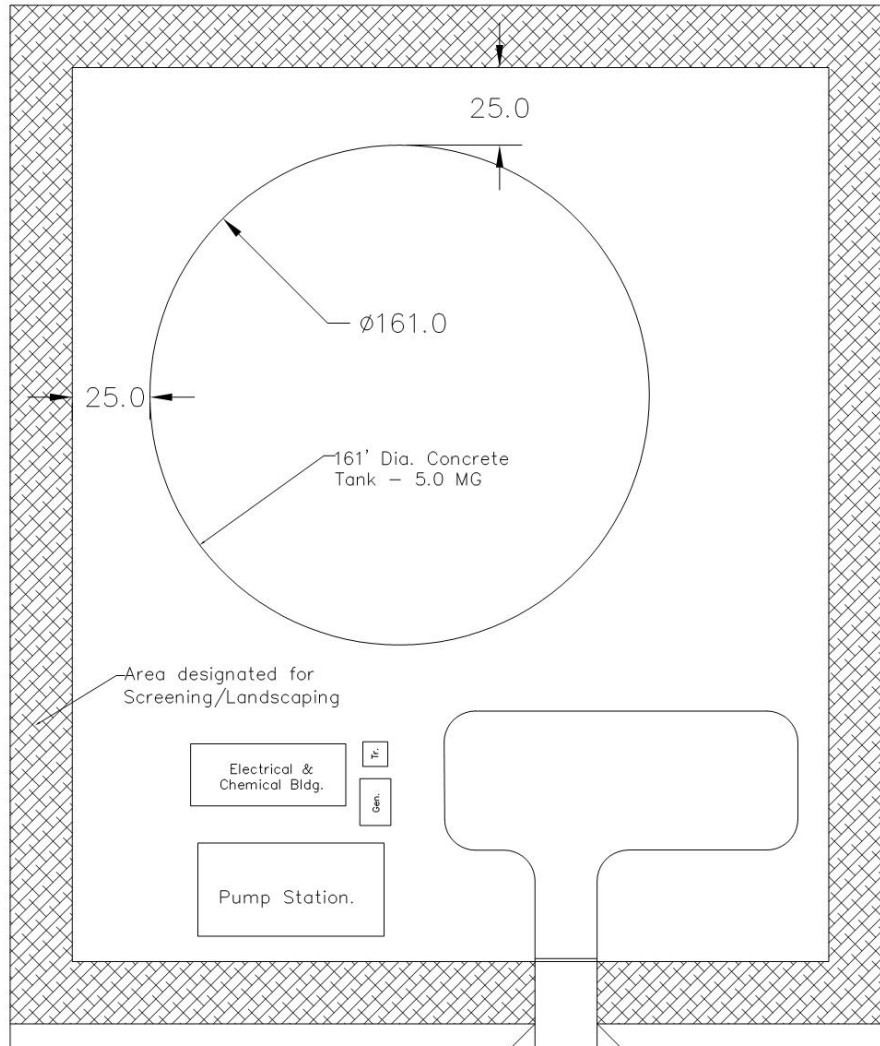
Typical Site Configuration for 5-MG Concrete Tank
